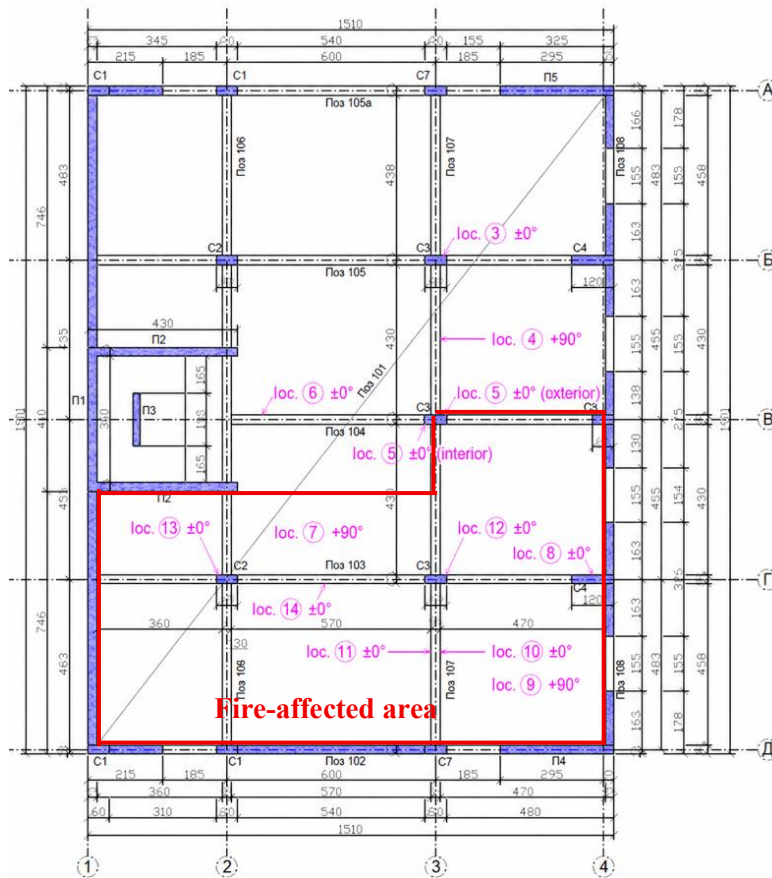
Basement floor plan showing the fire-affected area and locations of non-destructive testing
